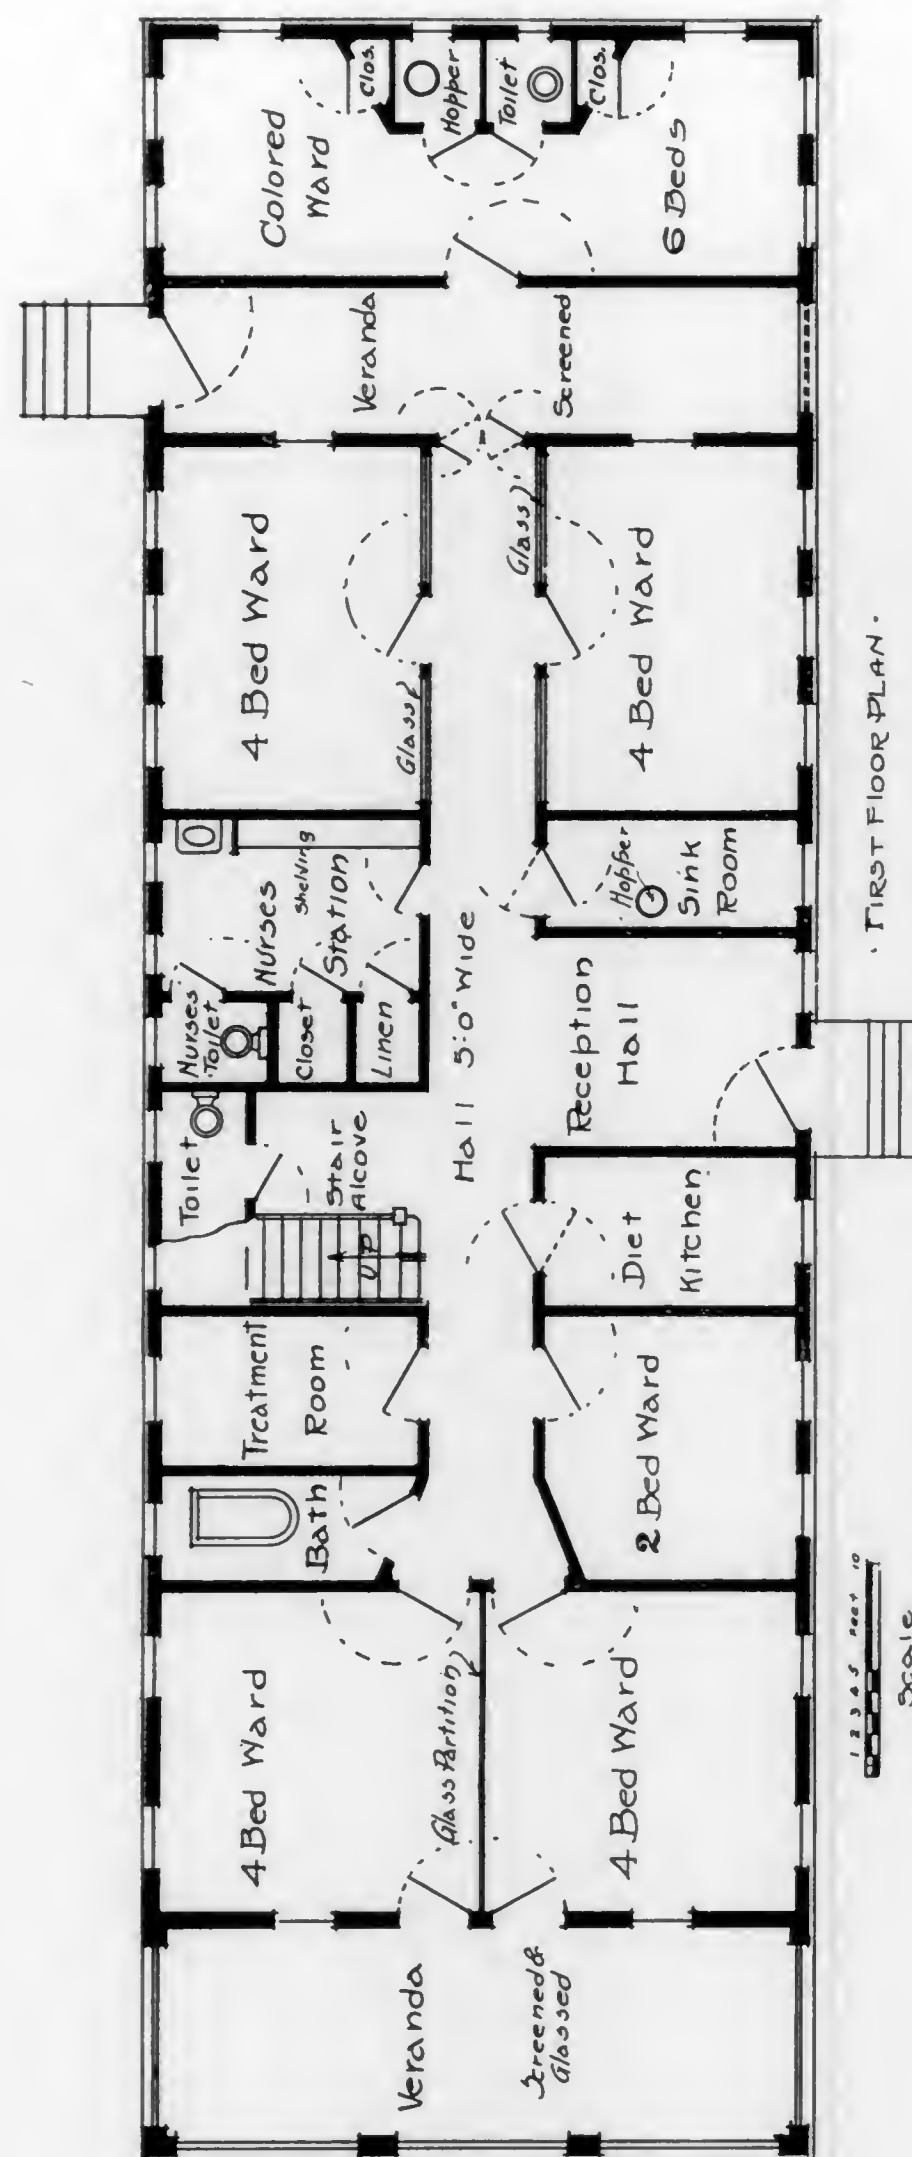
Suggestion for the floor plan of the orthopedic ward.
